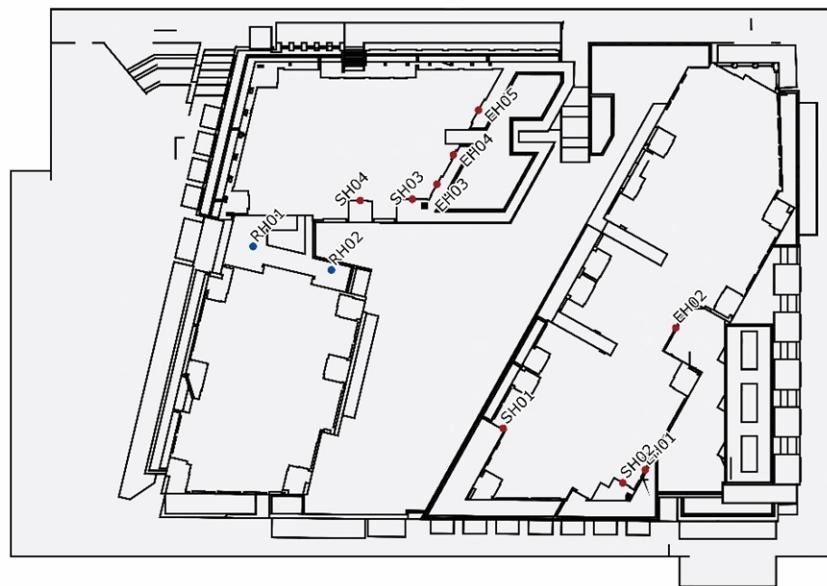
Layout of Pressure Sensors – Level 7 Plan
